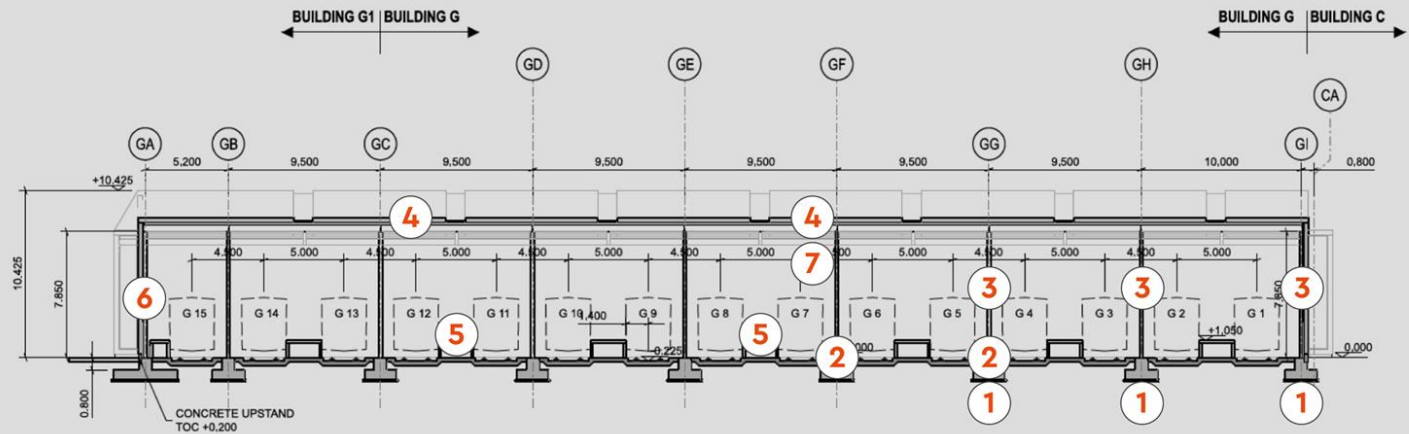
Dardistown Depot Building G Construction Sequence – Cross Section
